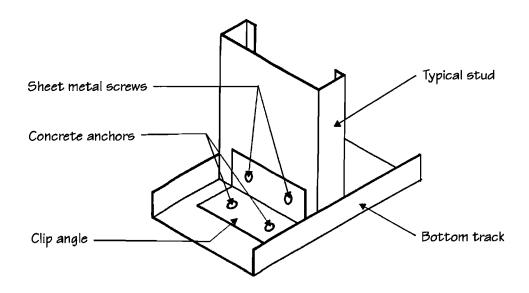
18 RETROFIT DETAIL FOR STUD TO TRACK CONNECTION
